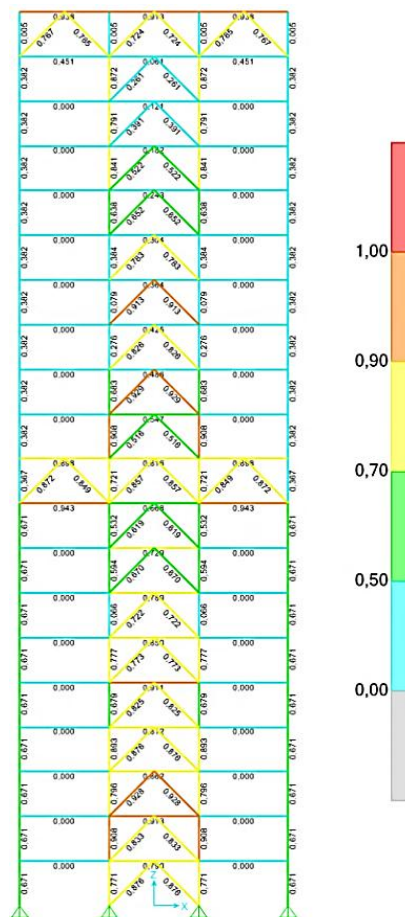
The ratio of utilization in an outrigger system. The beams between the outrigger arms showing zero utilization
